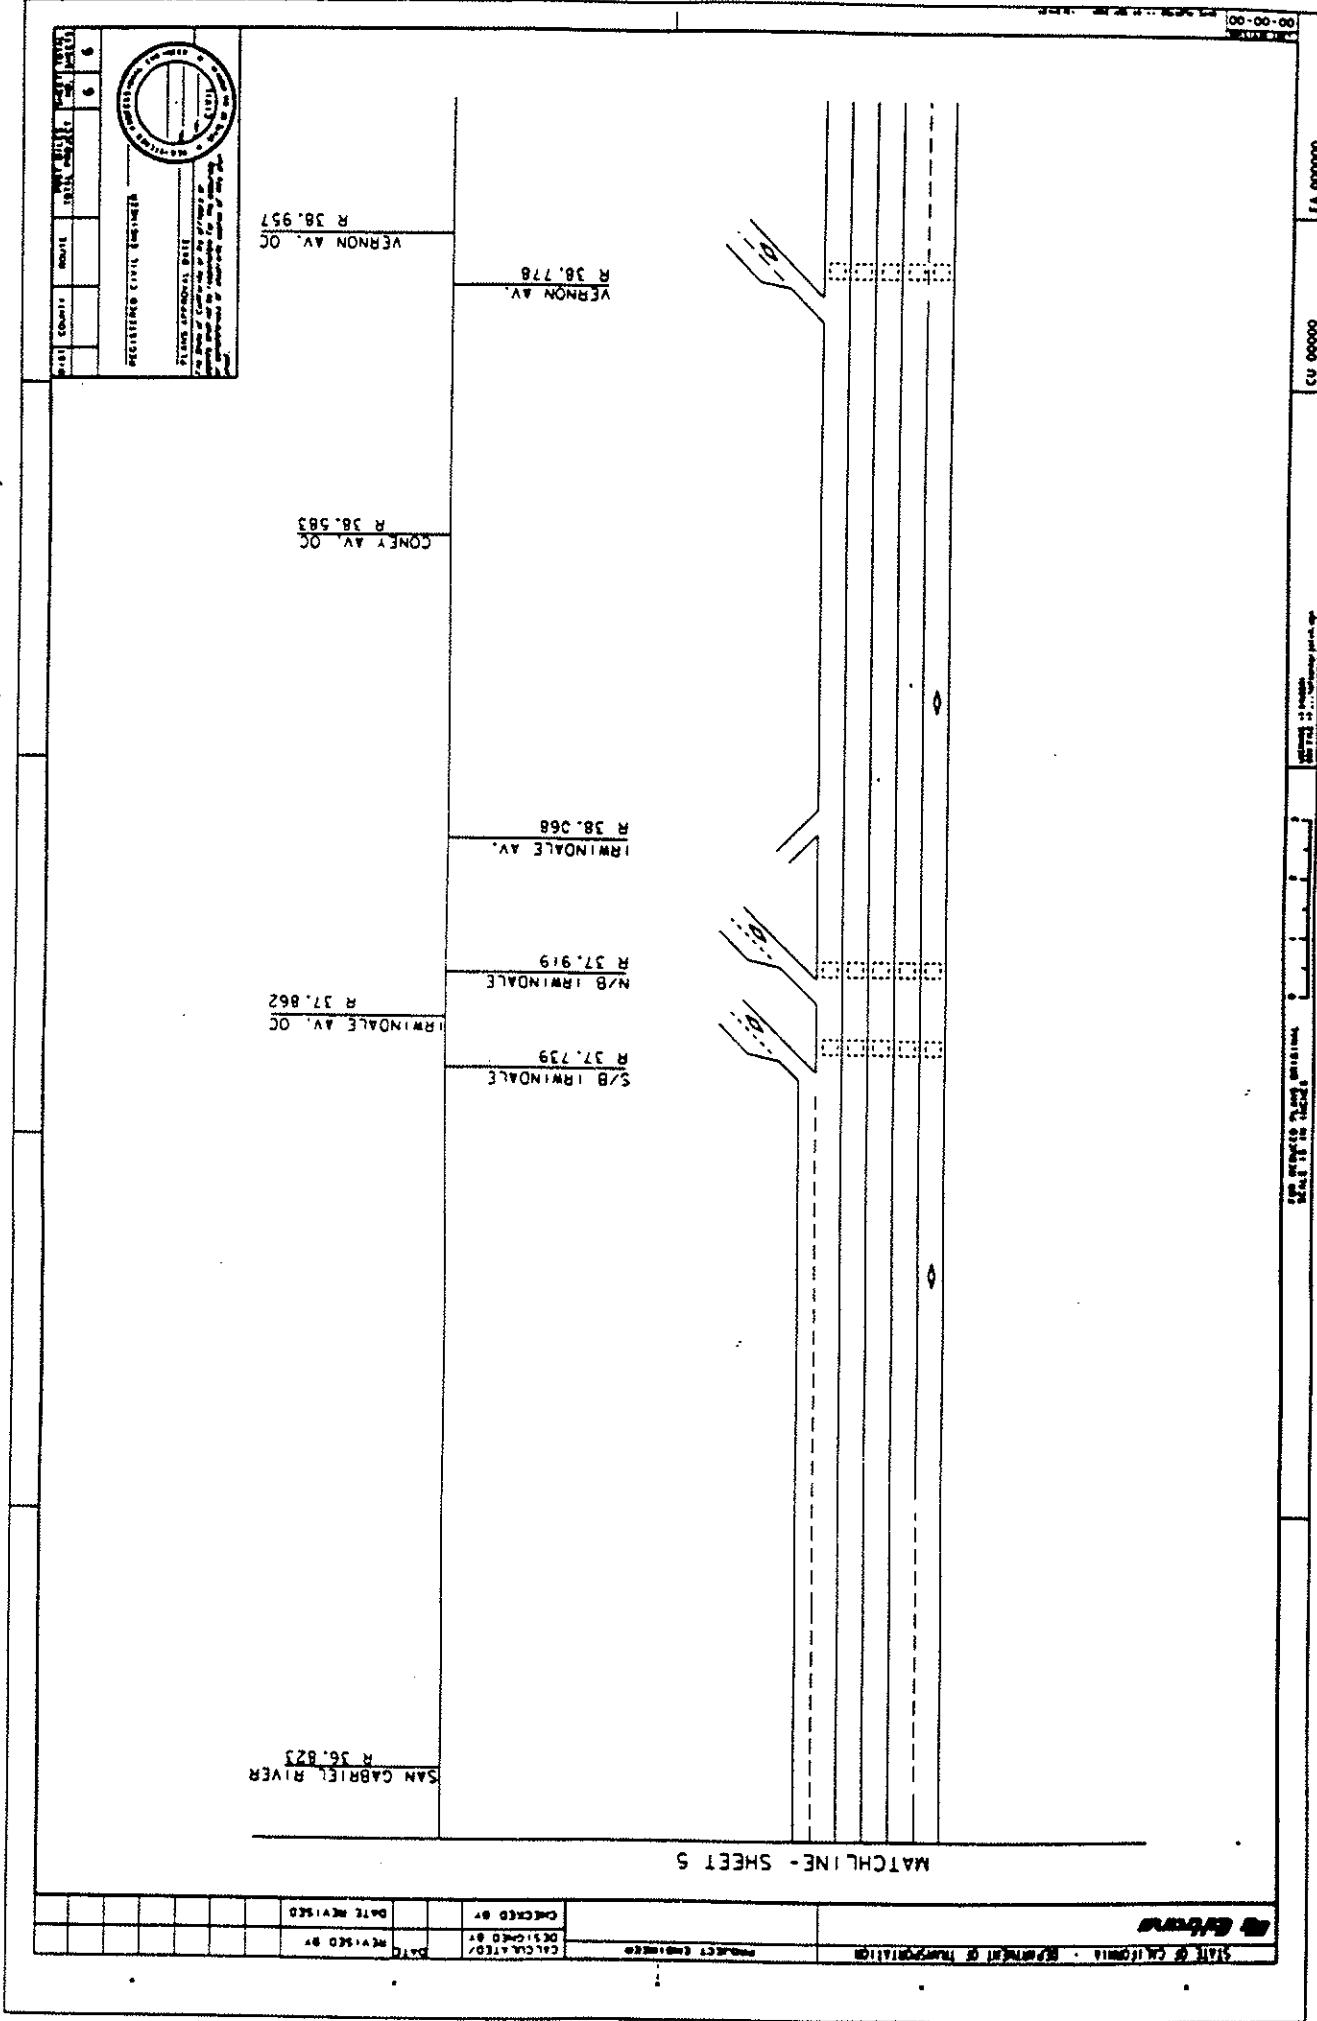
TESTING CORRIDOR GEOMETRICS (SHEET 4 OF 6)
